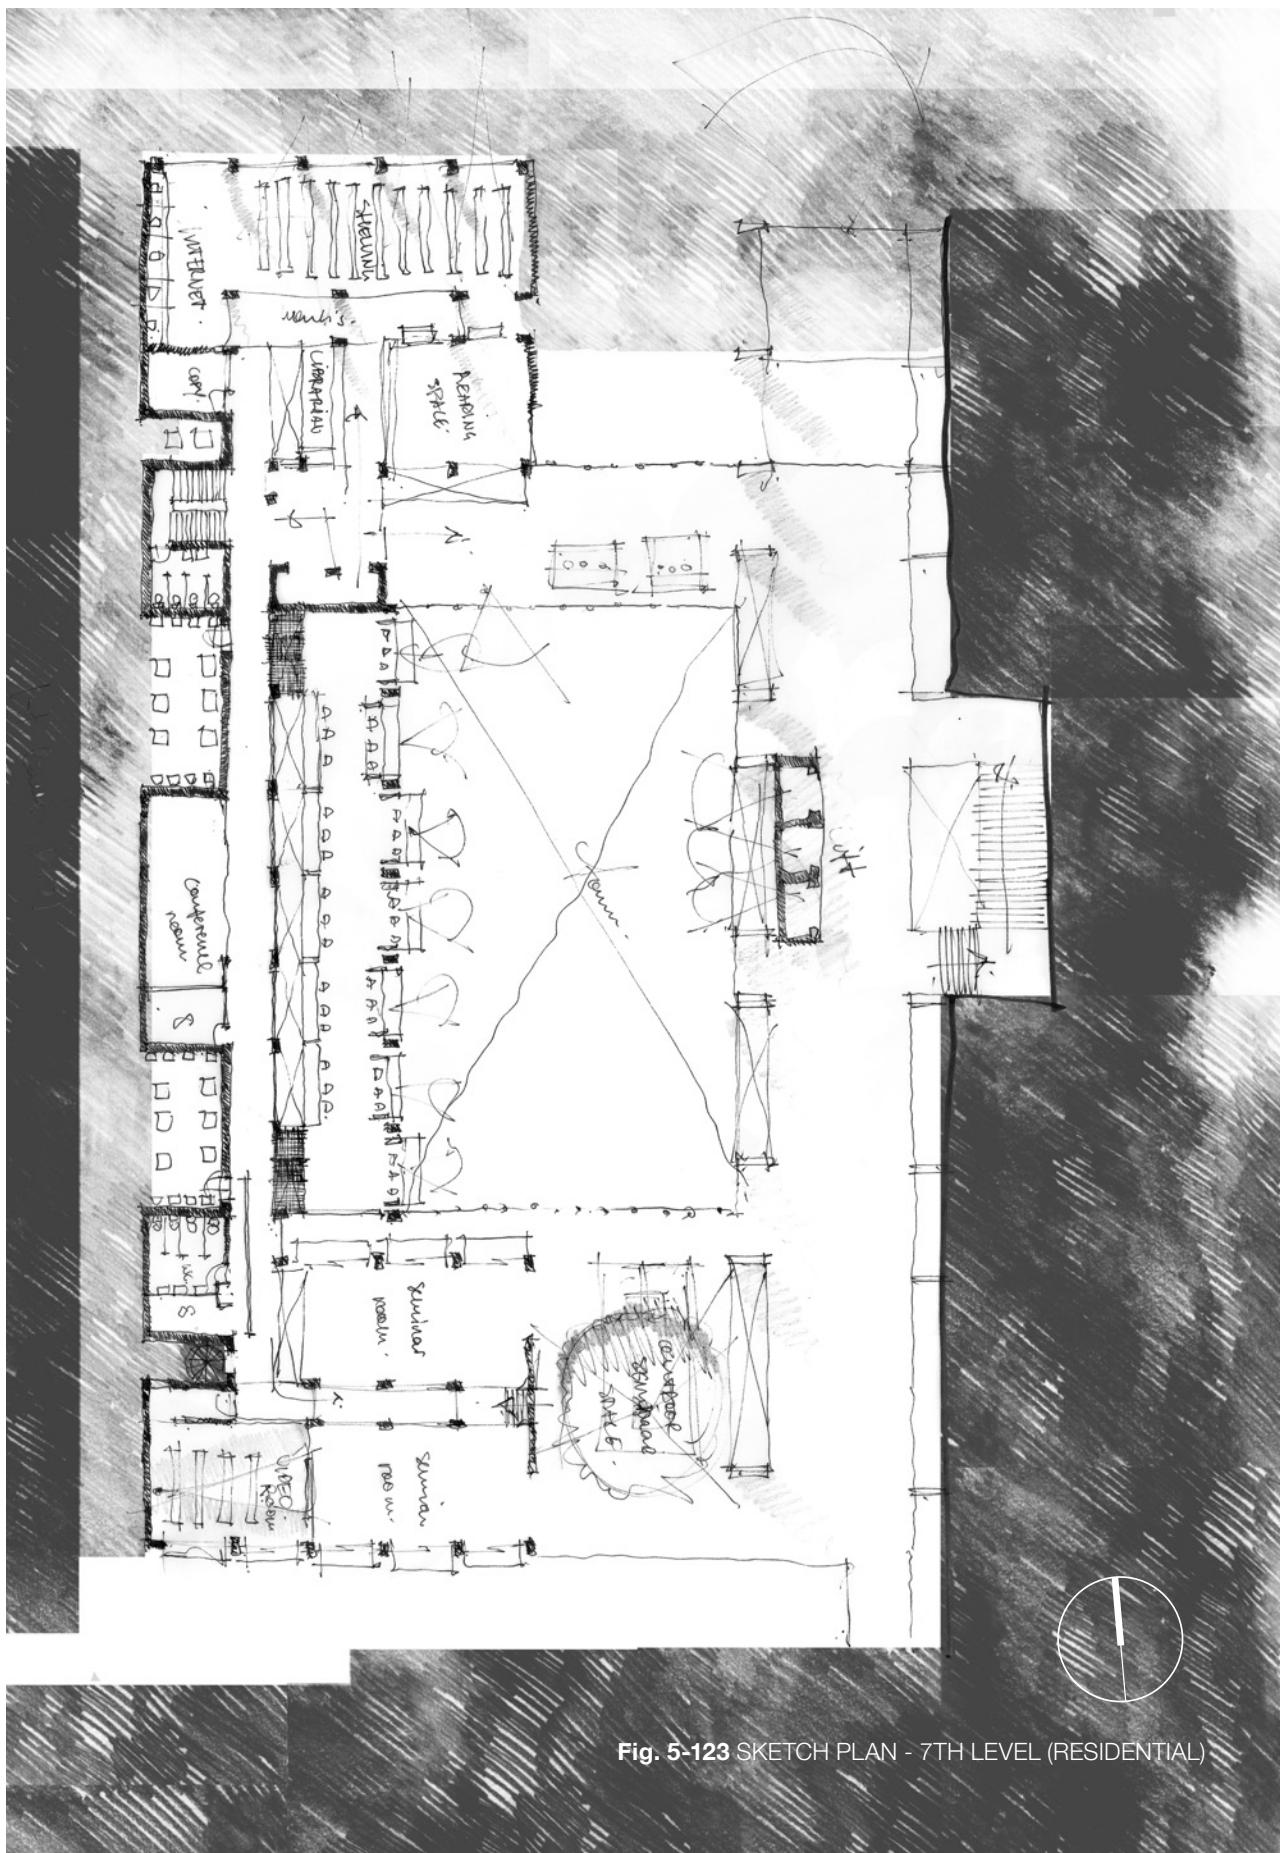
SKETCH PLAN - 7TH LEVEL (RESIDENTIAL)
